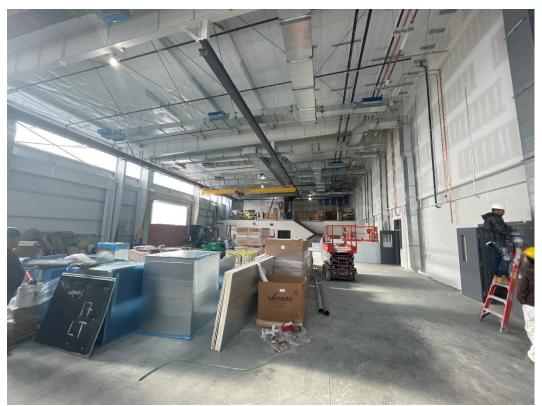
Building E Maintenance General Workshop (2/6/23)
